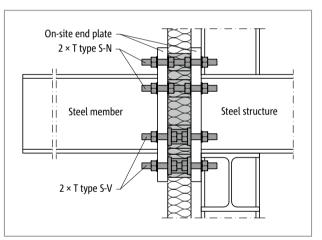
Schöck Isokorb® T Type S for cantilevered steel structures
